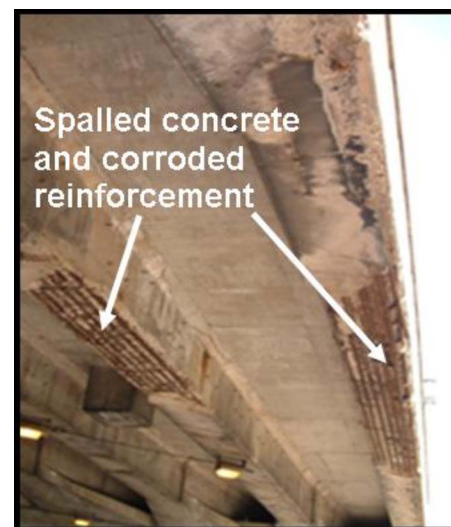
Heavy spalling of exterior girder with corroded reinforcement
